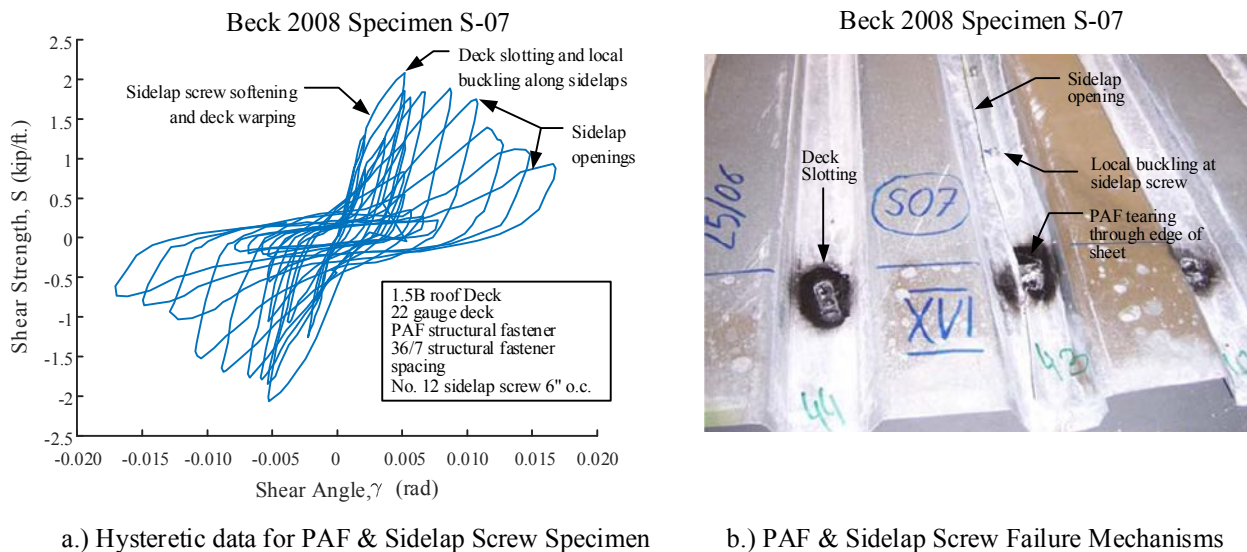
PAF and Sidelap Screw Specimen [adapted from Beck (2008)]
